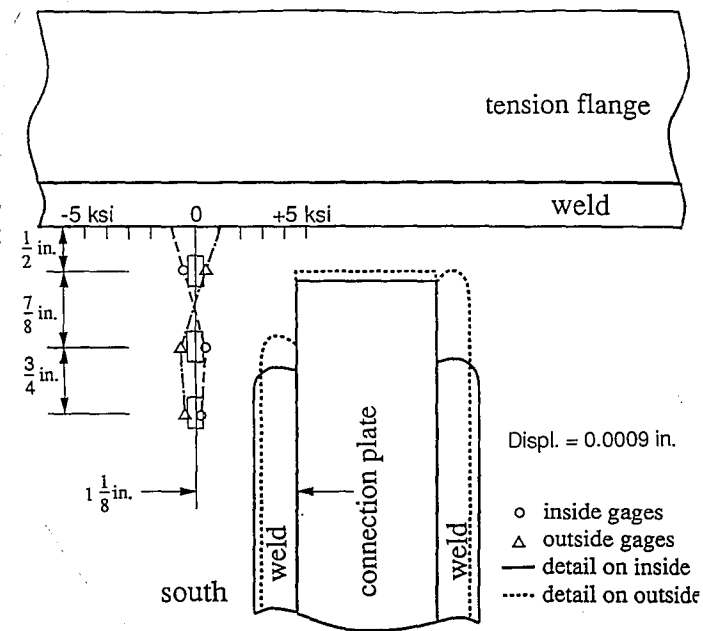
Static Stress Distribution on Outside Girder at Pier S7-5 (84 in. Girder) Before Retrofit with Dump Truck in Outside Lane (Worst Case)
